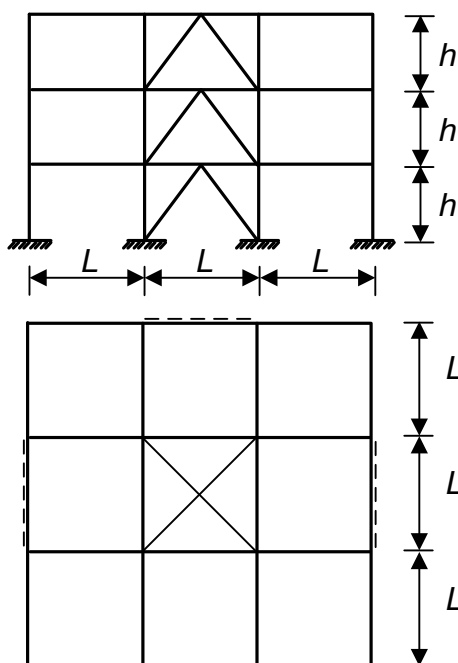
Elevation and ground-plan of the investigated frame. V-bracings are used in the outer plans, the central field is not loaded. $L = 6\text{ m}$, $h = 3.6\text{ m}$
